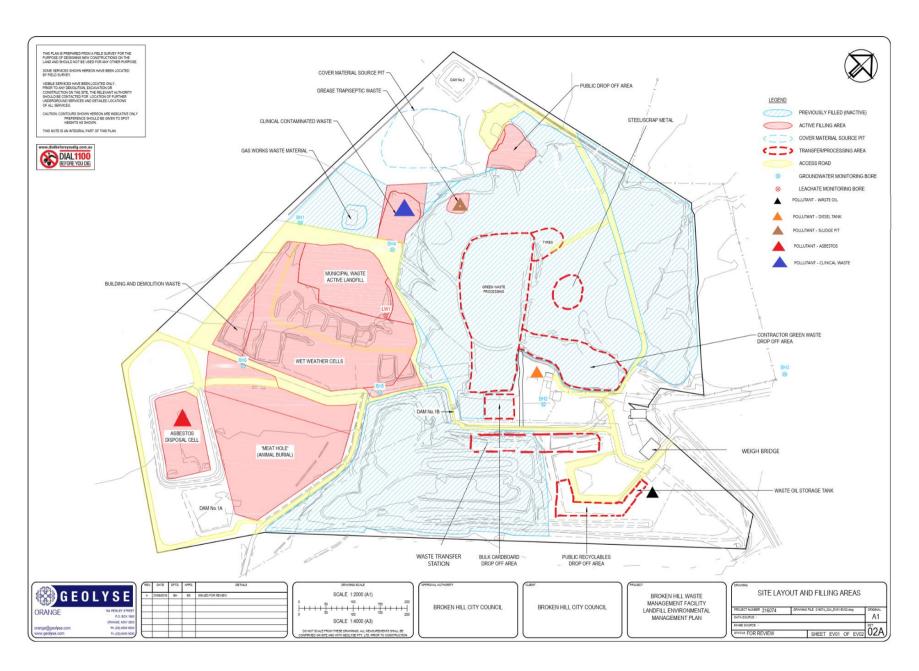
Broken Hill Waste Management Facility Layout Plan showing pollutant locations
